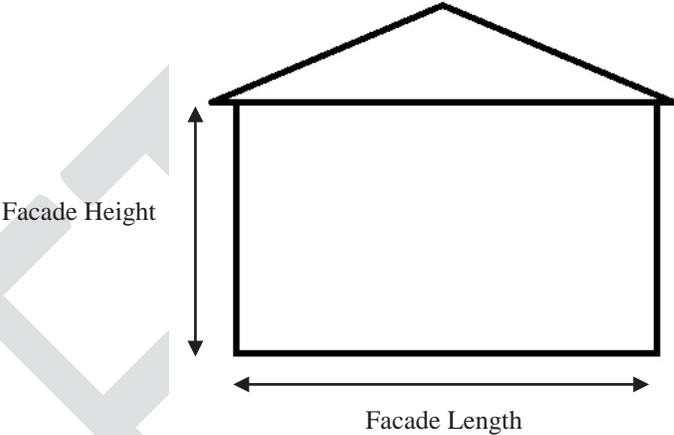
Multi-Tenant Façade Calculation Example #1
